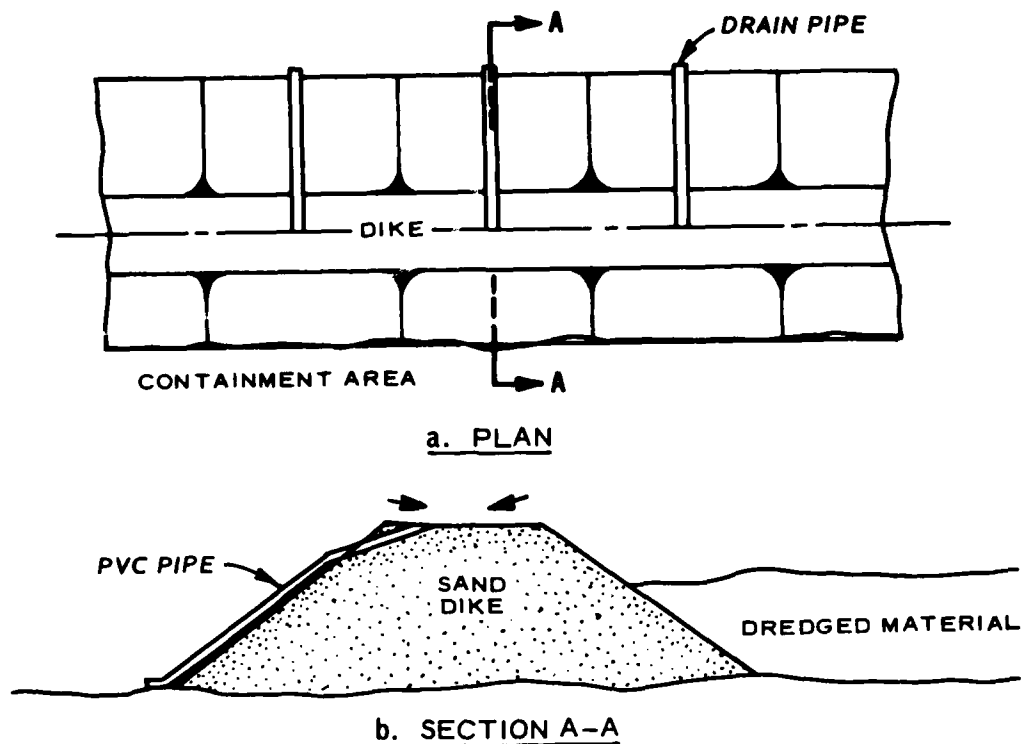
Protection of sand dike slopes from slopewash due to rainfall
